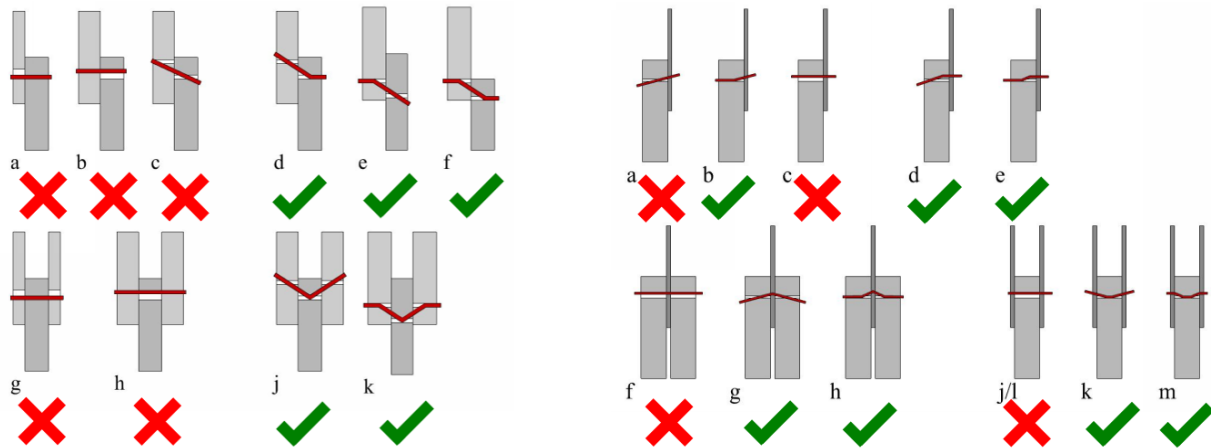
Johansen failure modes for timber-to-timber and timber-to-steel, showing which are considered ductile
